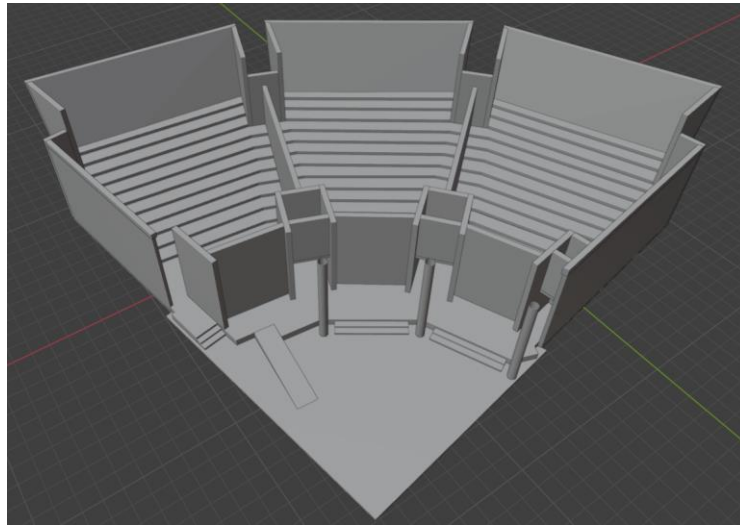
Auditoriums' early-stage BIM model [author's collection]
